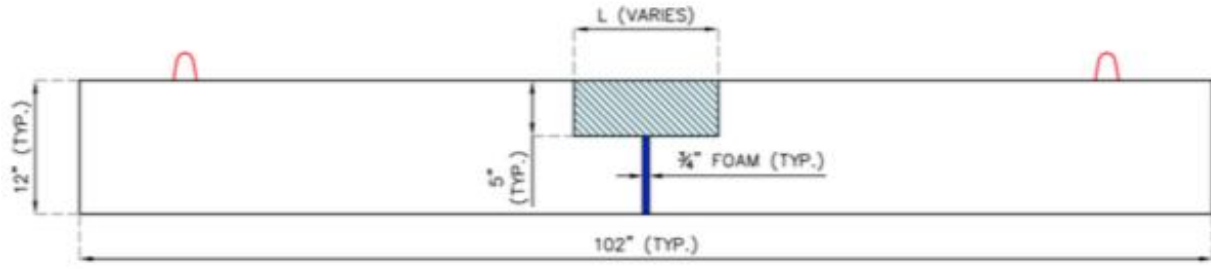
Elevation view of splice test specimens (Halbe et al., 2014)
